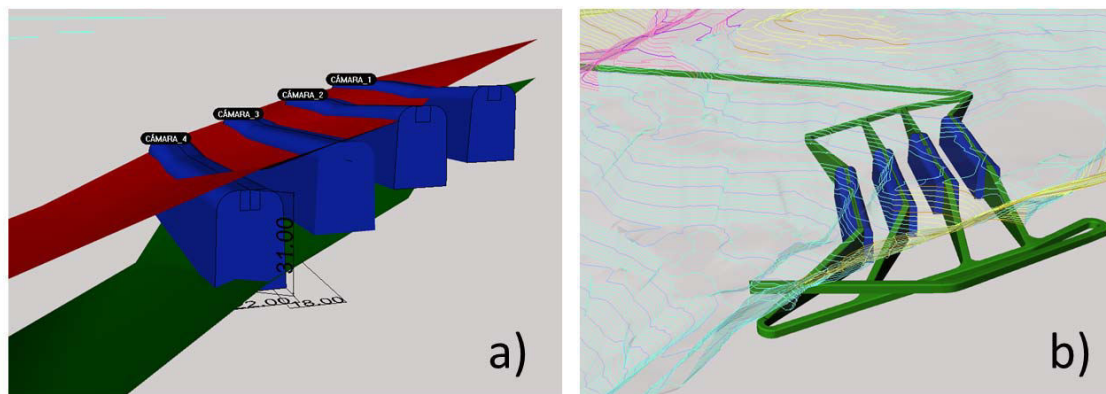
Roofing slate mine rooms designed following a direction oblique to the strand a) Detail of room locations between mineral limits. b) Mine layout including entrance, ramp, rooms and access drifts.
